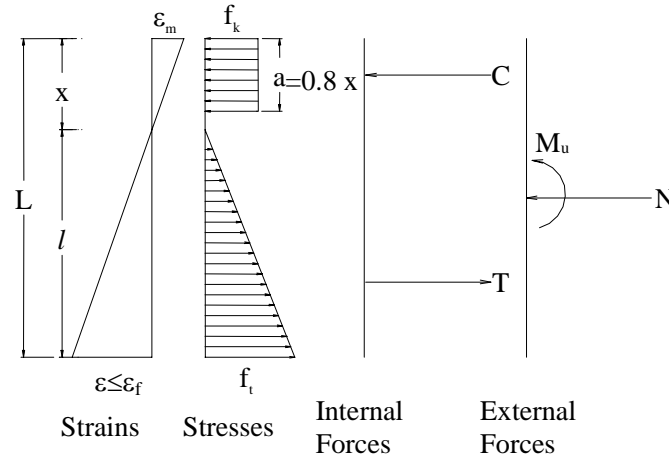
Strain, stresses, internal, and external forces in retrofitted masonry specimen
